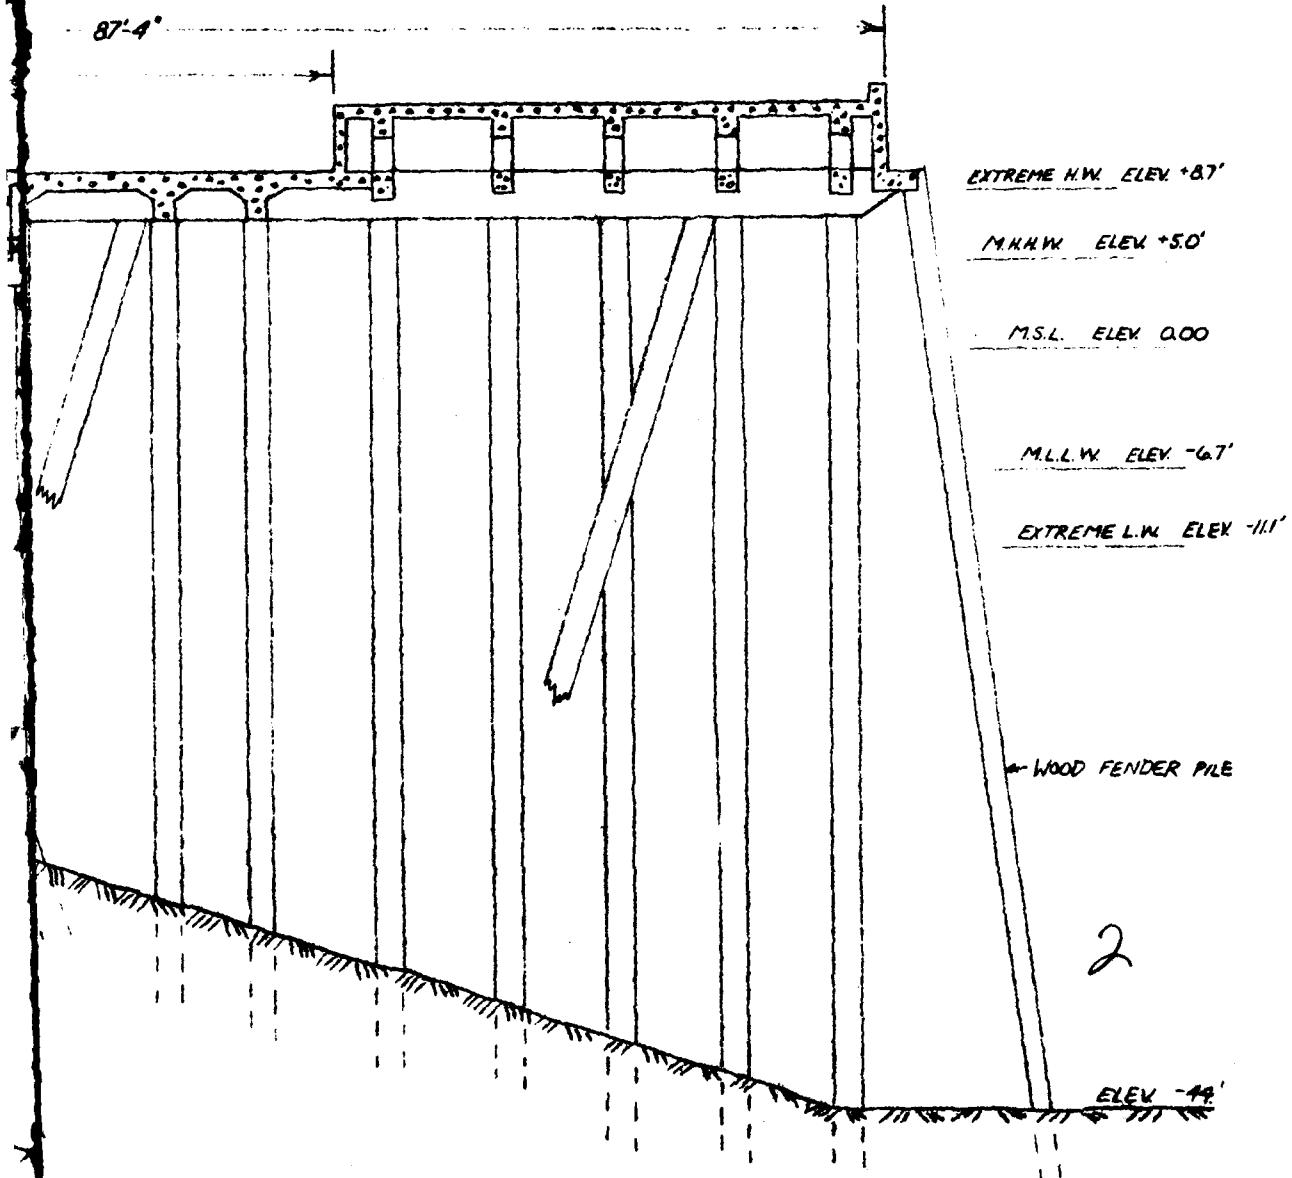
TYPICAL WHARF CROSS SECTION- SOUTH LEG
